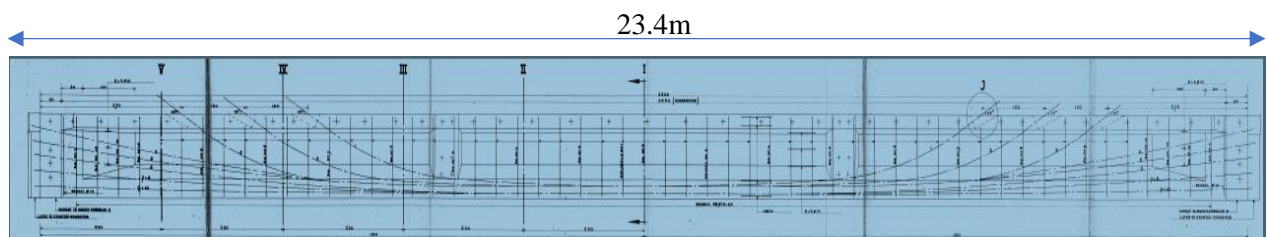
Post-Tensioned T Beam supporting Helperzoom bridge deck
